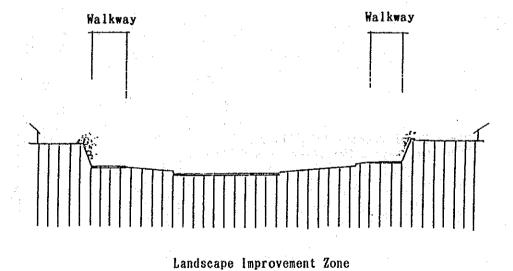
Space Improvement Plan of Chungroung Chong on Every Zone
